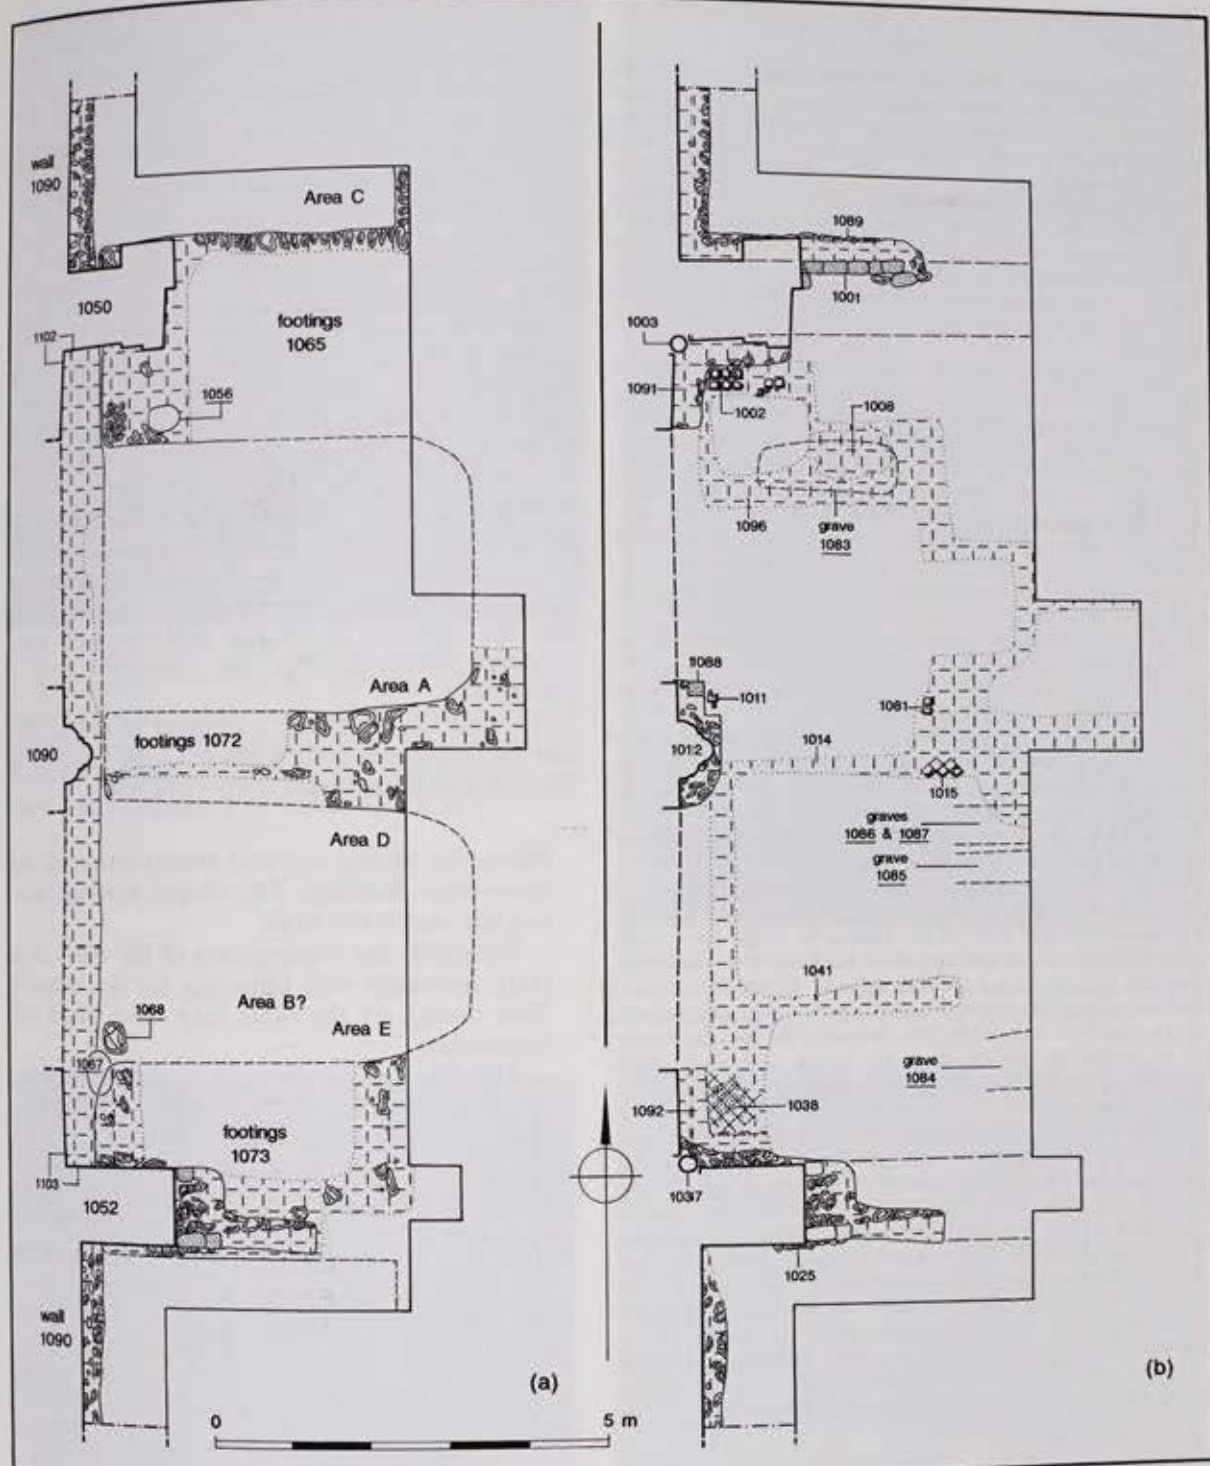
RA 1973: a) Plan of first, Norman, Lady Chapel. b) Plan of surviving features of second Lady Chapel.
